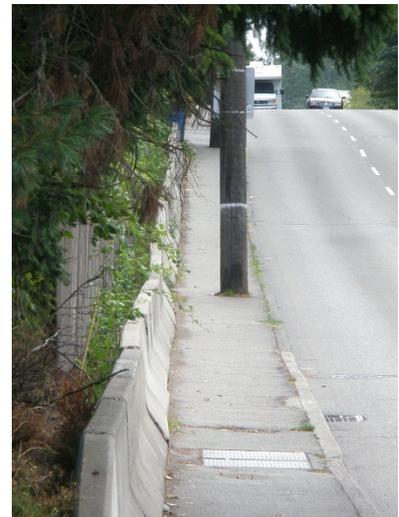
Utility Pole Blocking ADA access, 145th Street/SR 523
